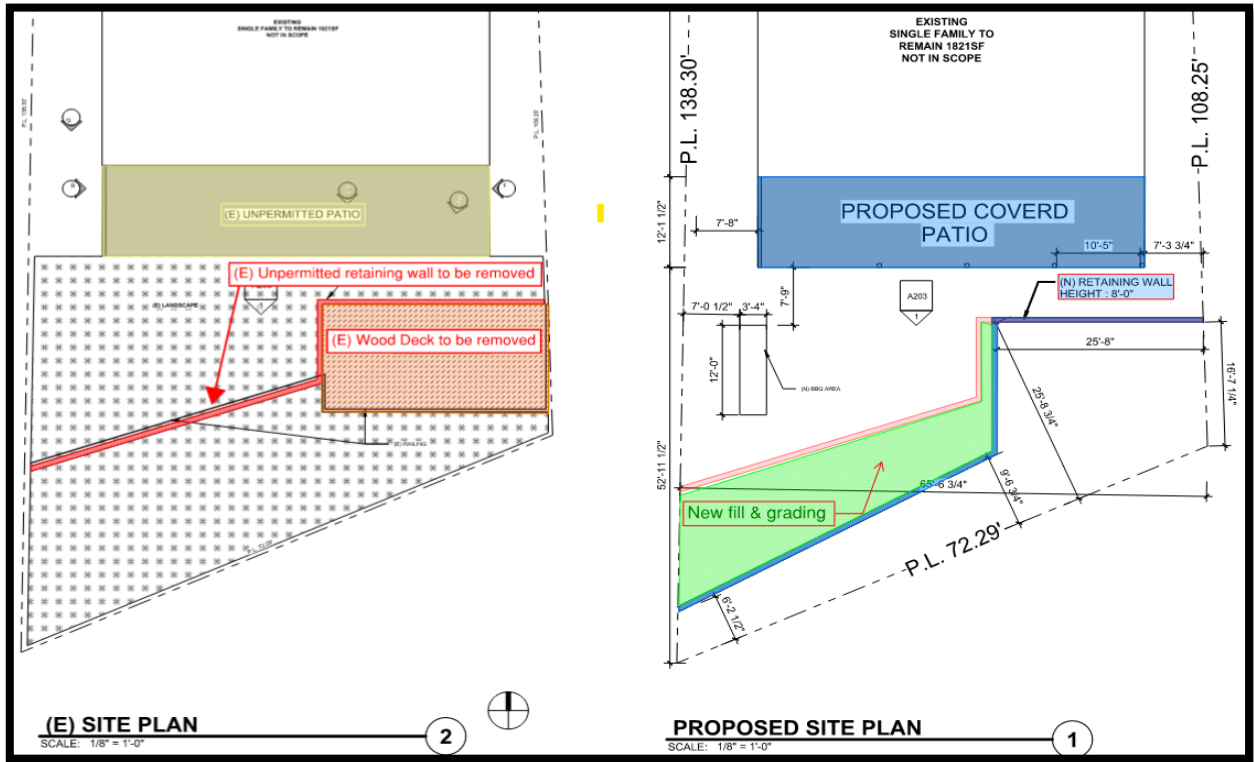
Site plans of the existing conditions and of the proposed improvements.
